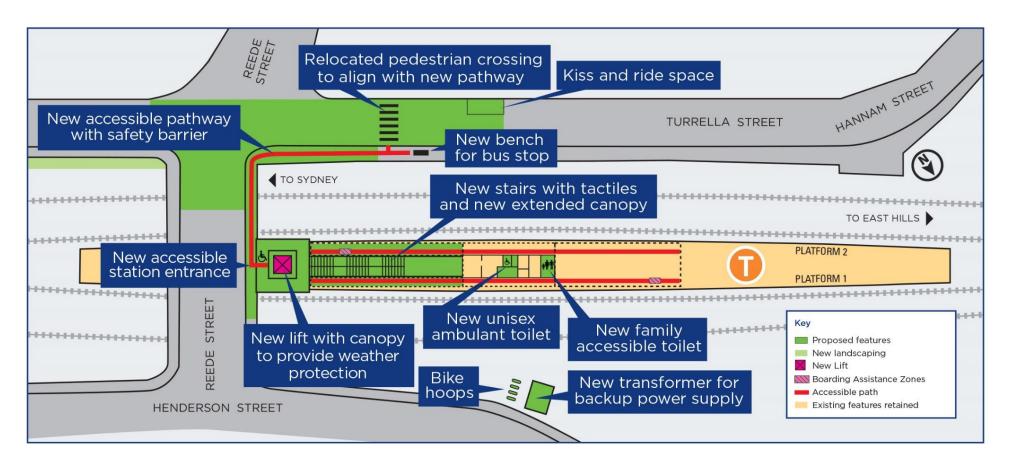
Plan showing the proposed new layout of the Proposal Area
